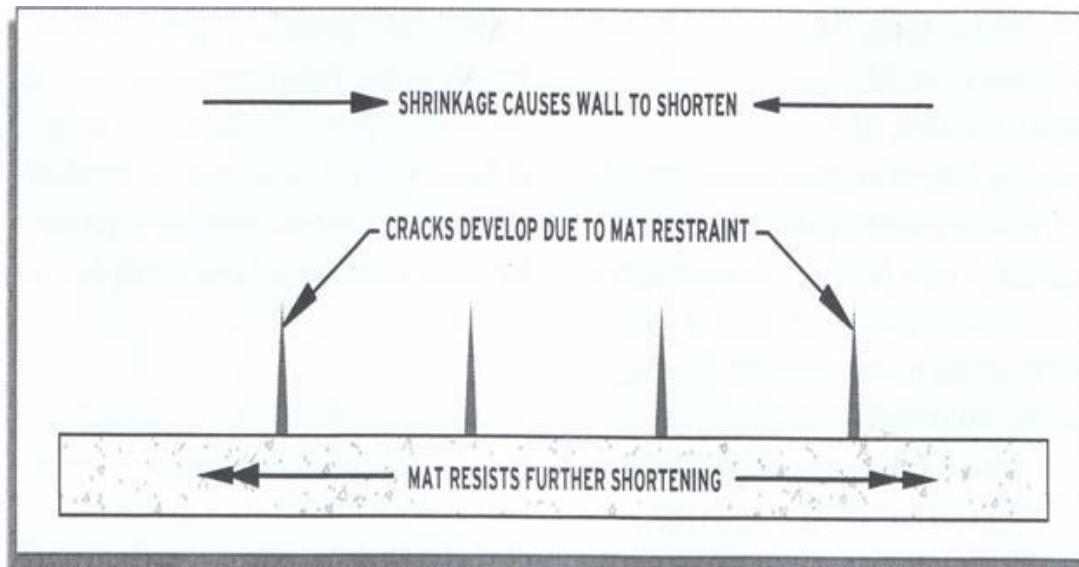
Cracks in the wall due to restraint with mat
